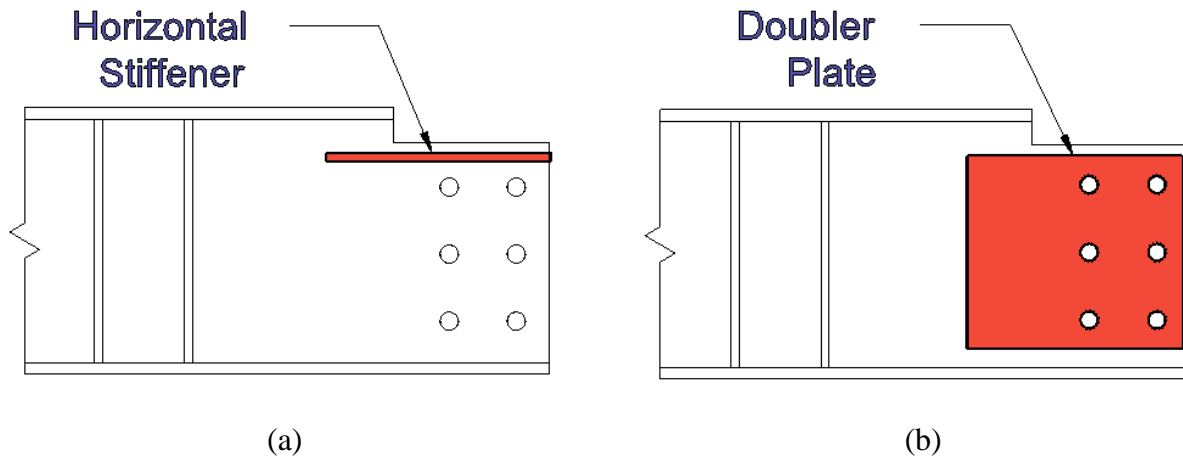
Coped beam reinforcements (a) horizontal stiffener (b) doubler plate
